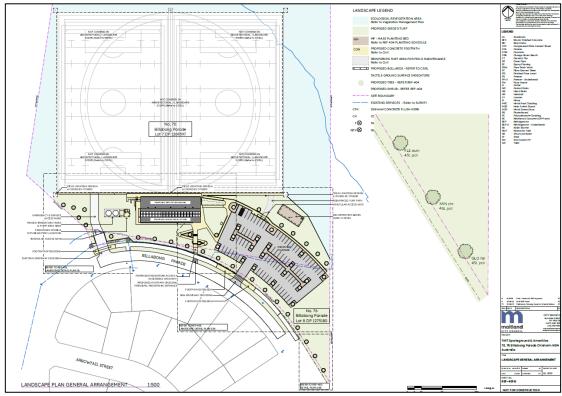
Proposed Site Plan Extracted from Attachment 1 (Source: Council, 31/07/2025)
